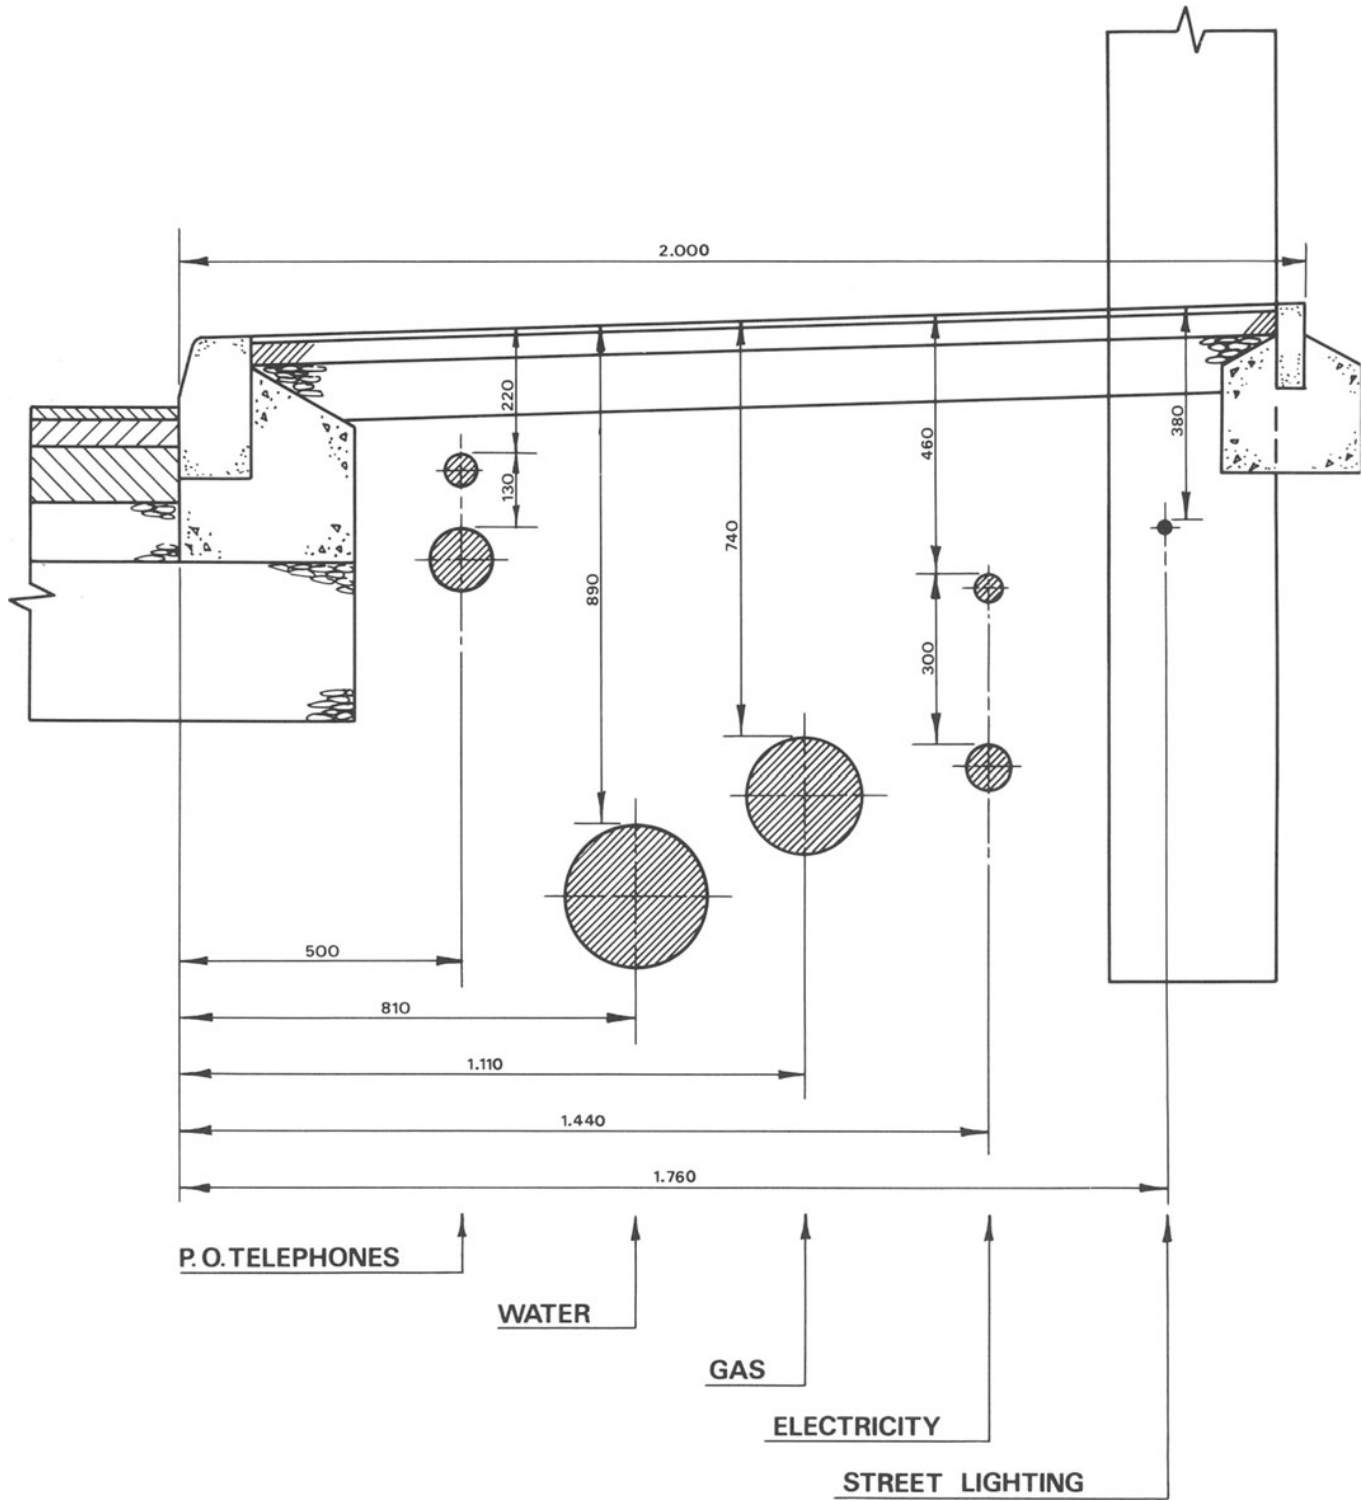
Dimensioning: typical section showing layout of Public Utilities mains
